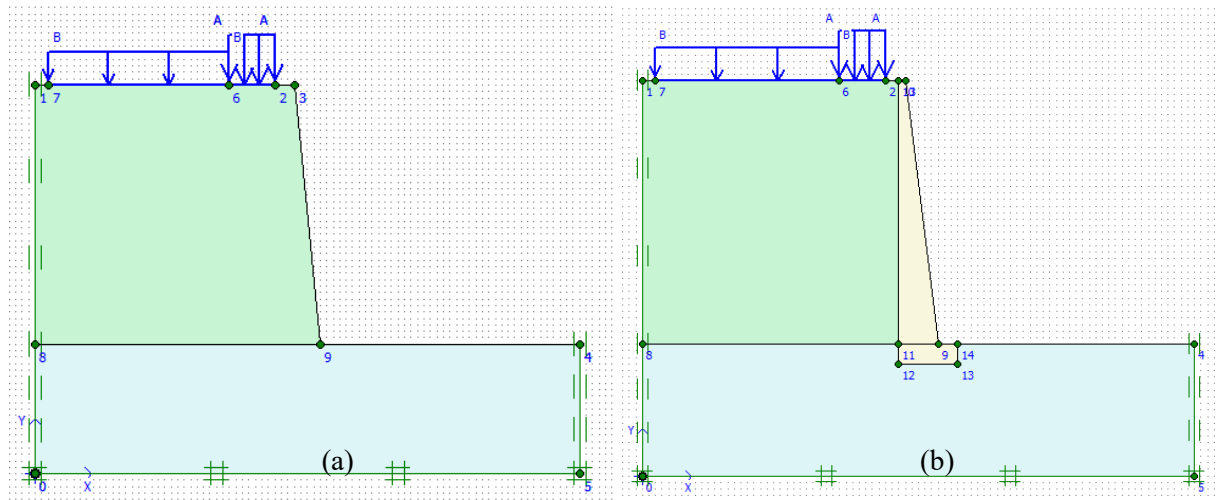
Estimated existing slope: a) natural slope b) with gravity wall reinforcement
